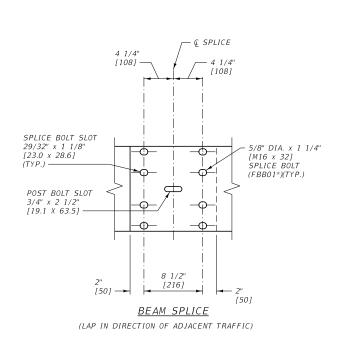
DETAILED DRAWING REFERENCE DWG. NO. STANDARD SPEC SECTION 606 606-05B
